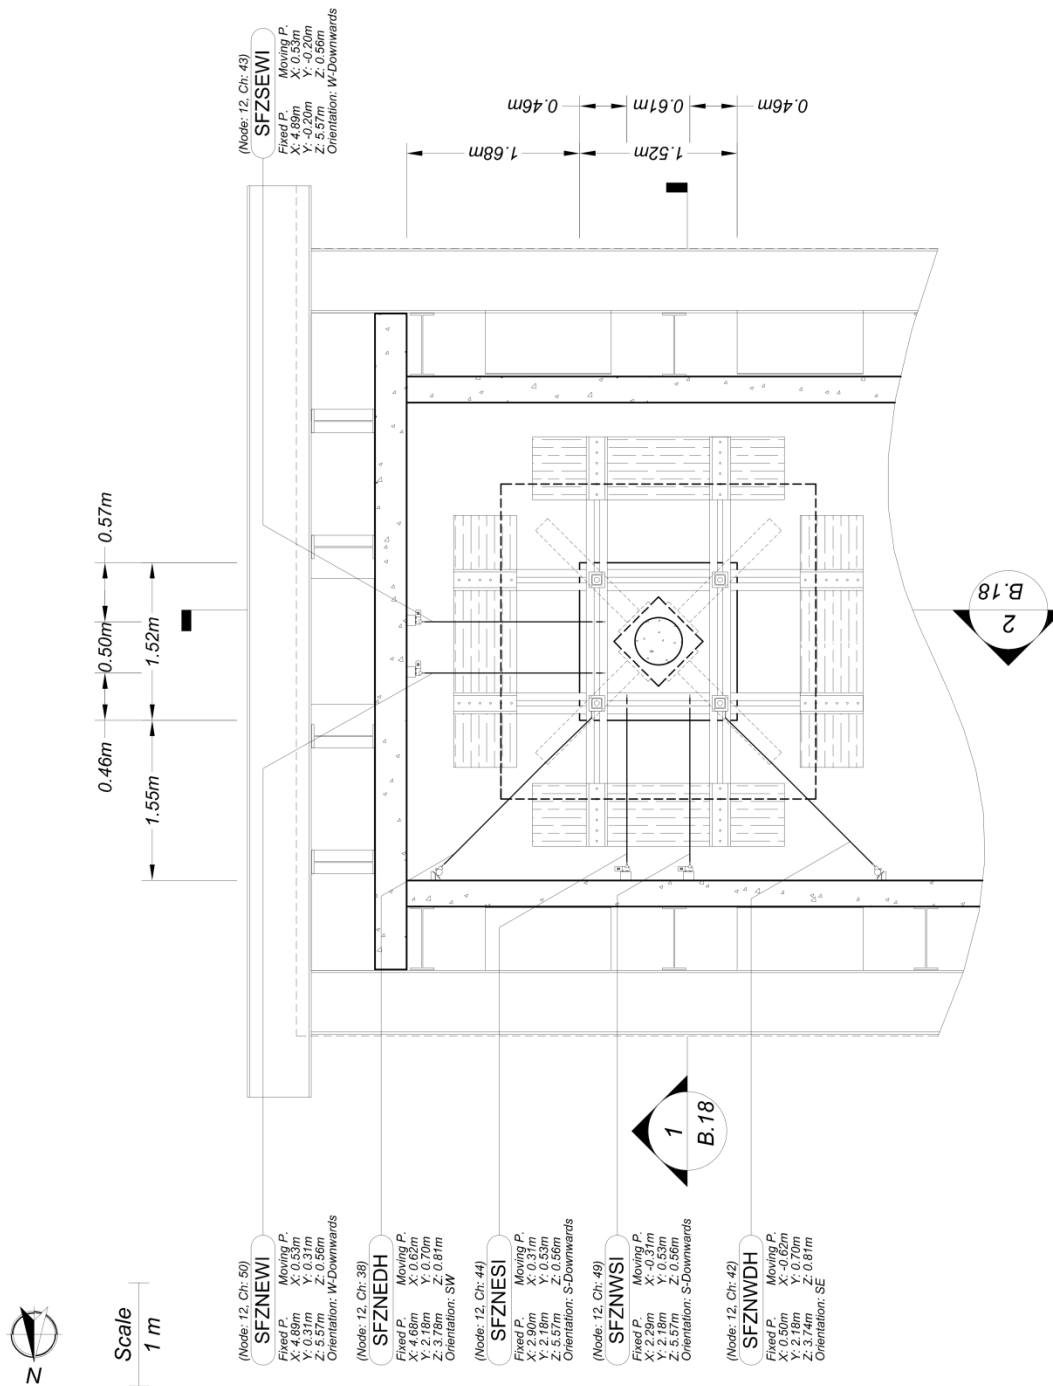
West elevation view of string potentiometers mounted on top of the R/C mass blocks of the aligned specimen.
